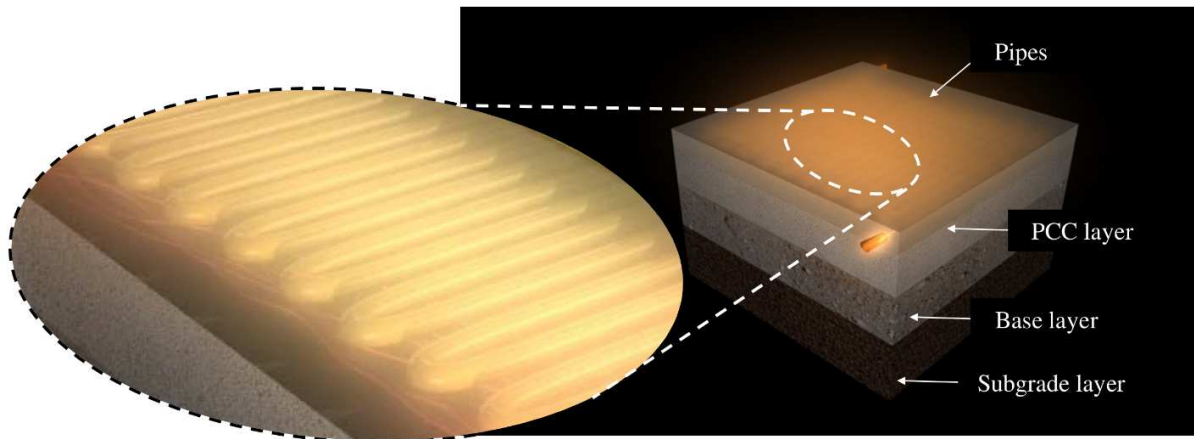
Details of a hydronically-heated pavement system (HHPS)
